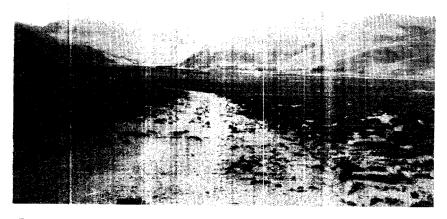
Part of the road between Khamba Dzong and Tingkye Dzong in southern Tibet. Open, flat valleys such as the one shown here are characteristic of much of Tibet, permitting roads to be built with little in the way of actual construction. This would be characterized as a "simple highway."
